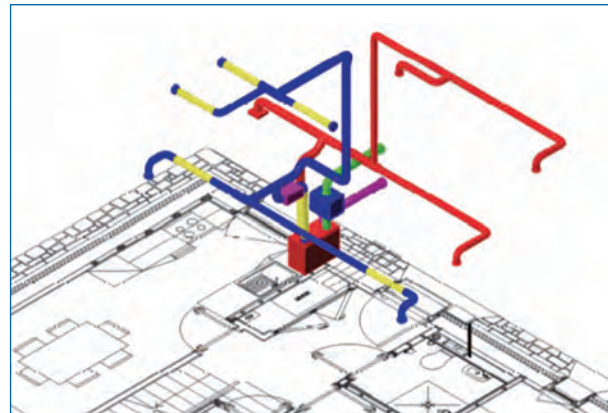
Larch House ventilation. Damp exhaust air is removed from the kitchen and bathroom ceilings (shown in red), passed through the heat exchanger in the MVHR, and pre-heated fresh air is brought into bedrooms and living areas (shown in blue).
